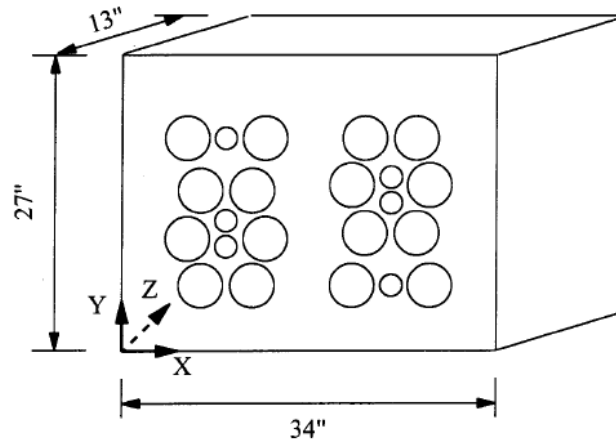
Element dimensions and core locations (Bartlett and MacGregor 1994b)
